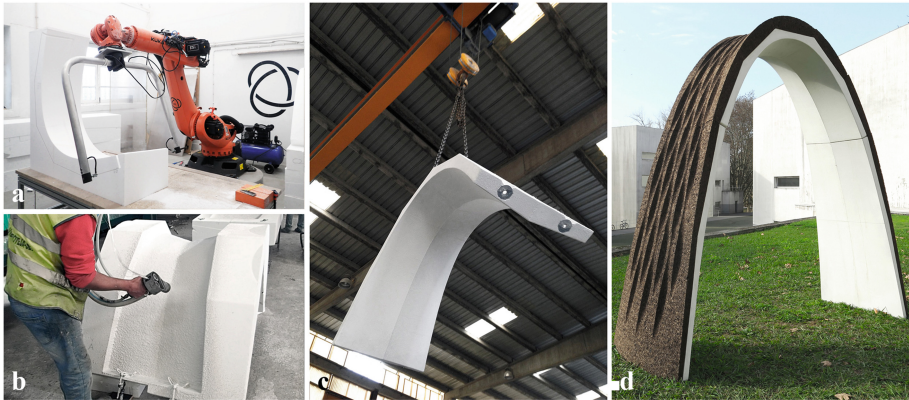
(a) Hot wire cutting of mold with interior ruled surface exposed - center component; (b) GRC spray process after assembled mold – center component; (c) finished GRC center arch component; (d) final assembled Corkcrete Arch.
